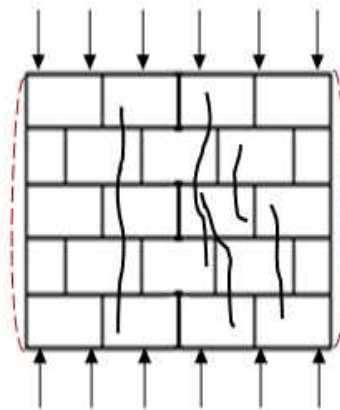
Typical failure pattern in a brickwork wall (Lenczner, 1972)
